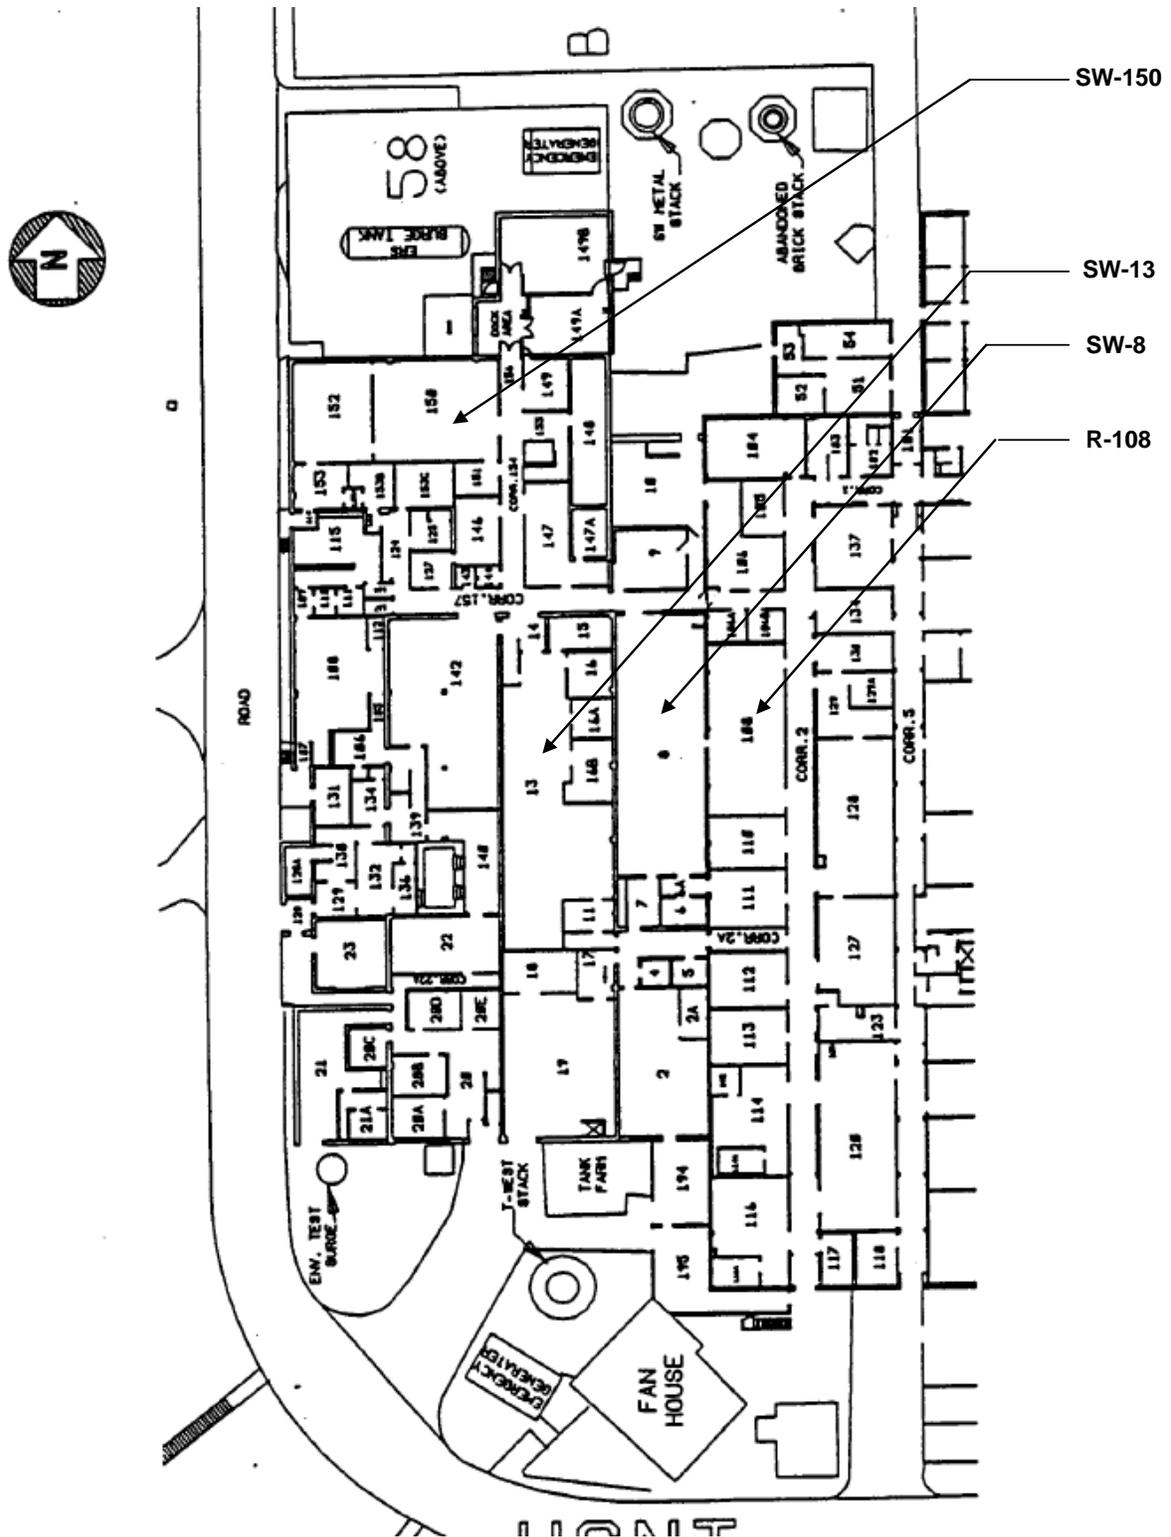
SW/R Complex layout – first floor (SRDB Ref ID 26833).
